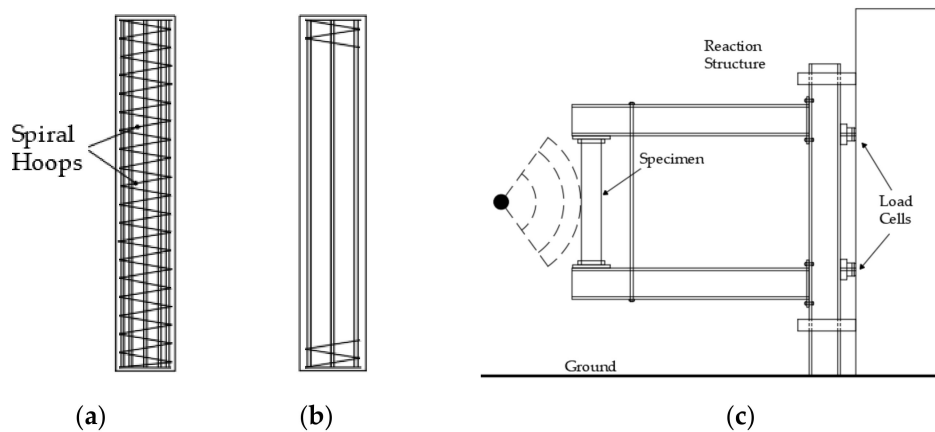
Reinforcement position in specimens: (a) RC column and (b) CFFT column; specimen position: (c) test setup [18].
